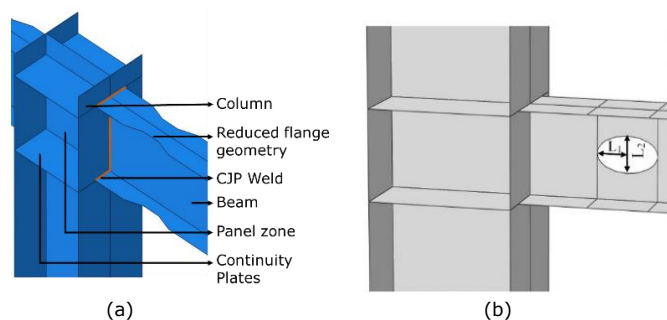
Schematic view of (a) a typical RBS connection [1] and (b) a RWS connection
